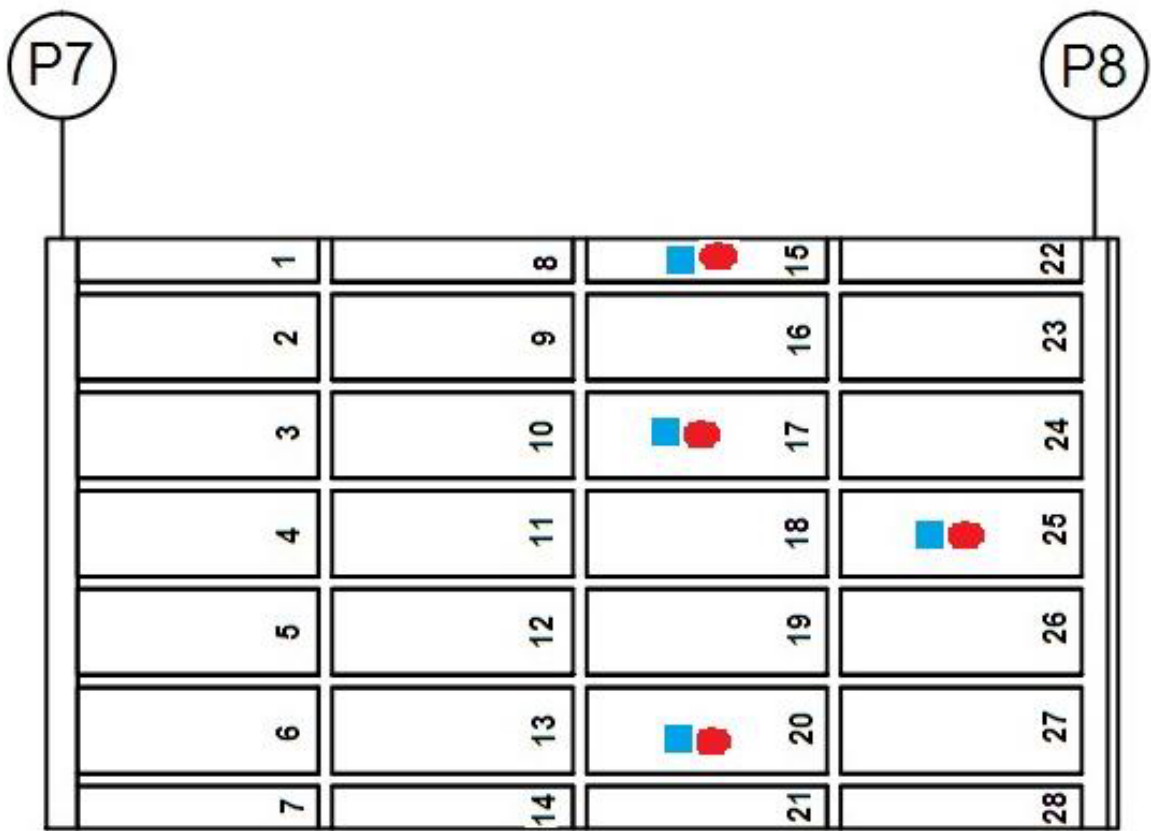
Test conducted at various locations between Pier P7 and Pier P8
